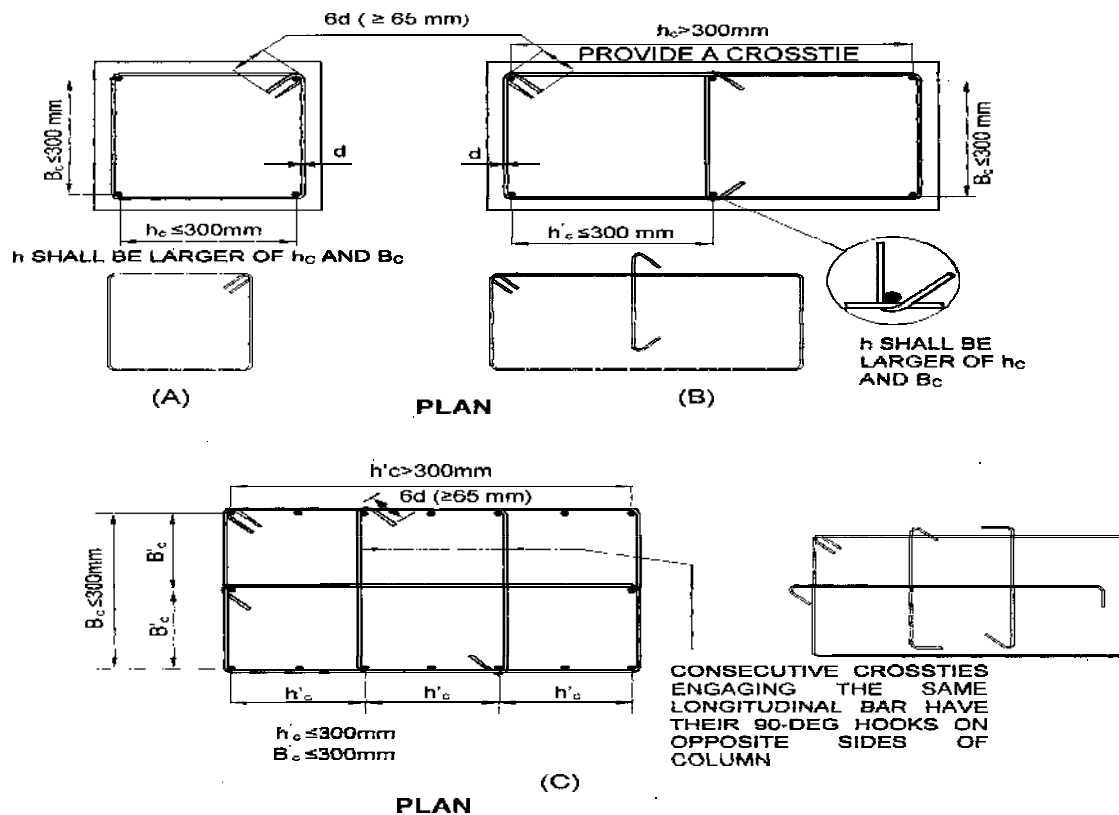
DETAIL OF TRANSVERSE REINFORCEMENT IN COLUMNS
